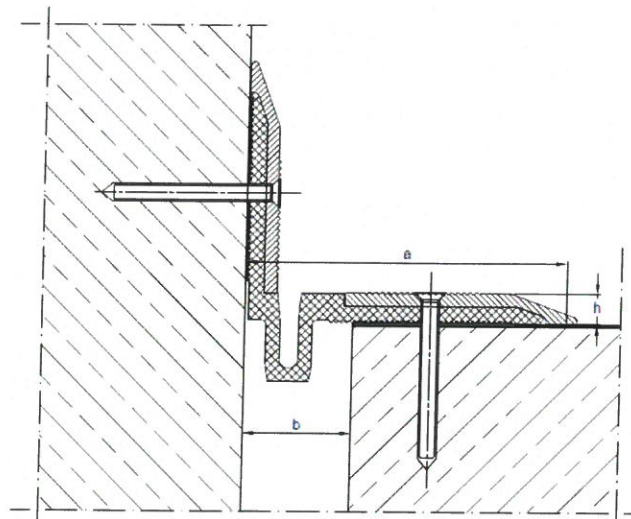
CONECTO PARK SL 190.30.CV waterproof expansion joint profile – wall mounted surface installation
